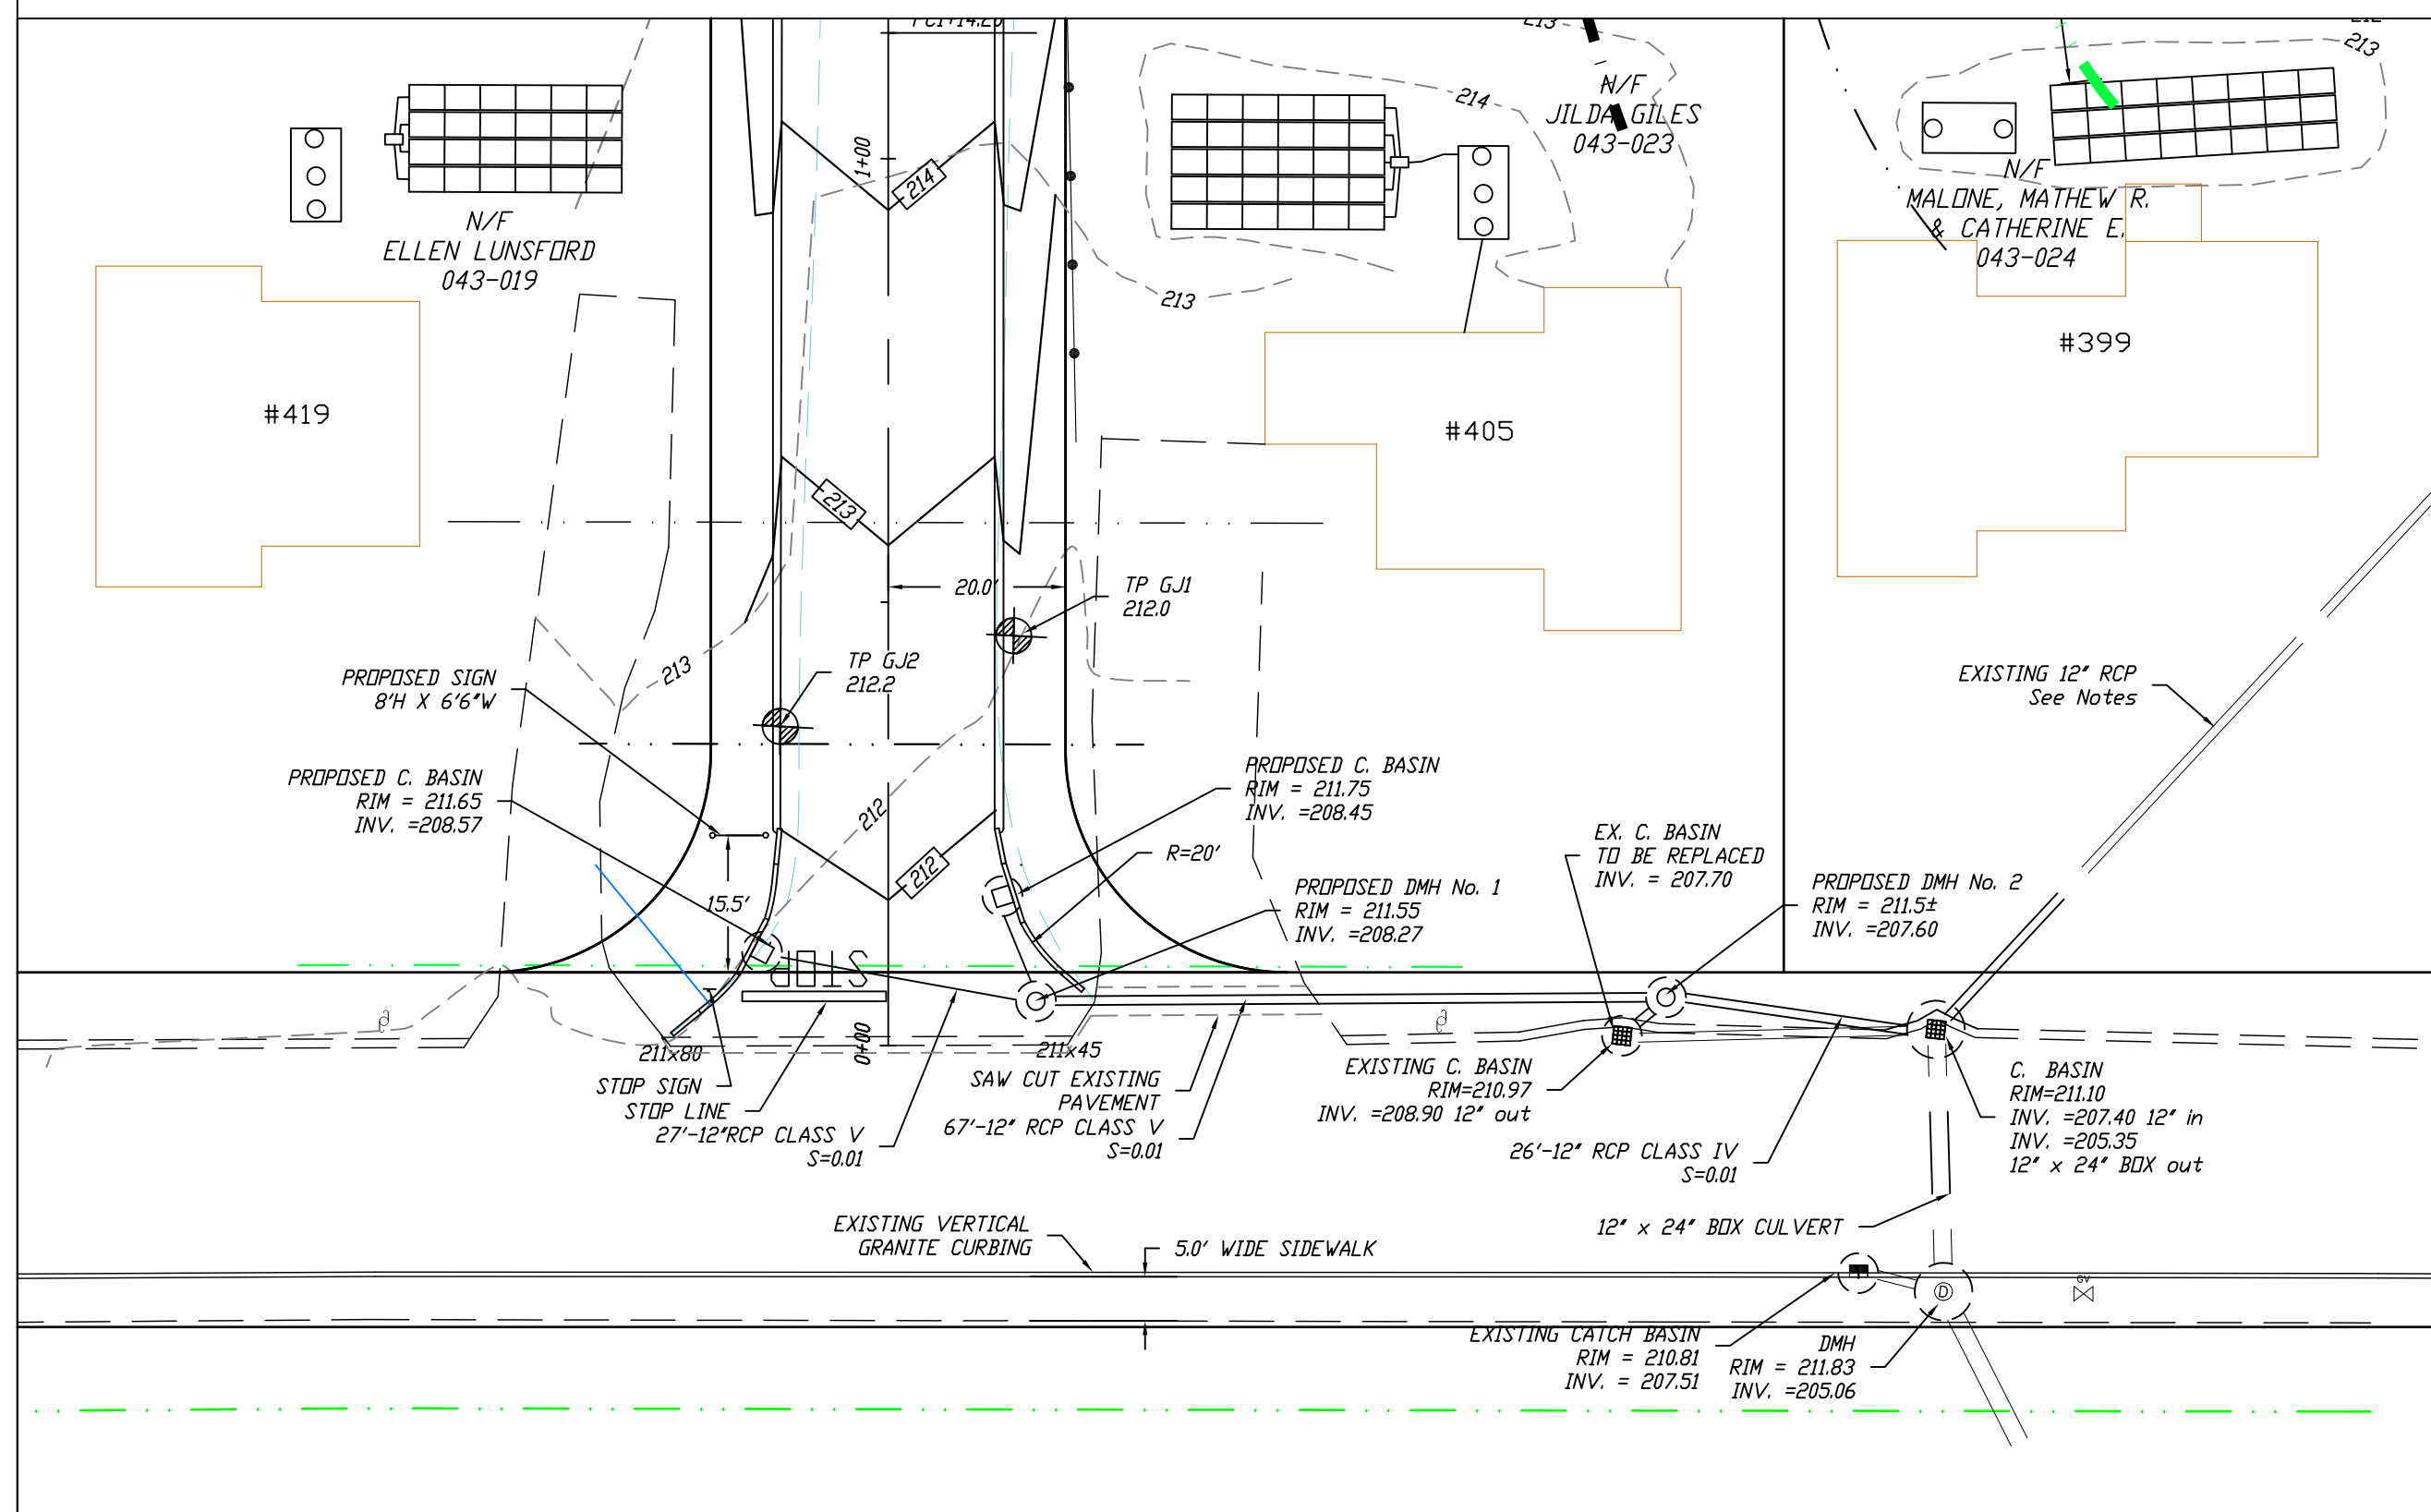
DETAIL SHEET SITE PLAN 409 CANTON STREET STOUGHTON, MA
